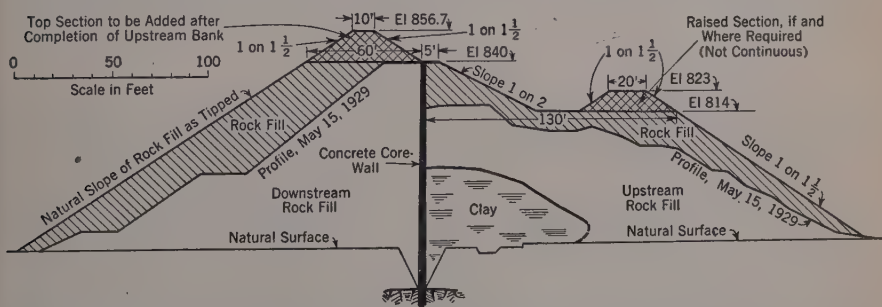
TYPICAL CROSS-SECTION SHOWING ADDITIONAL ROCK-FILL PROPOSED BY BOARD,
